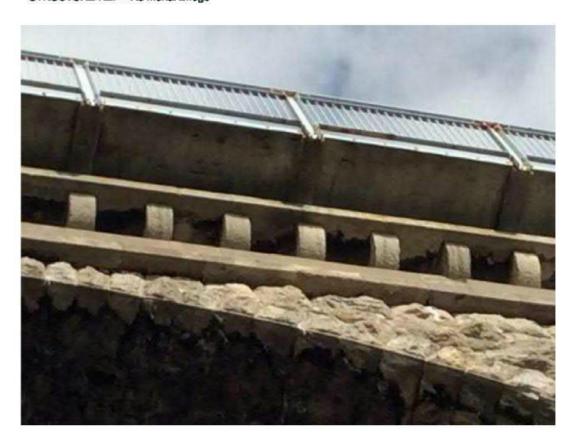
Parapet beam or cantilever - wide areas of spalling and exposed rebar to soffit of cantilevered footway to the west of spans 1-4
